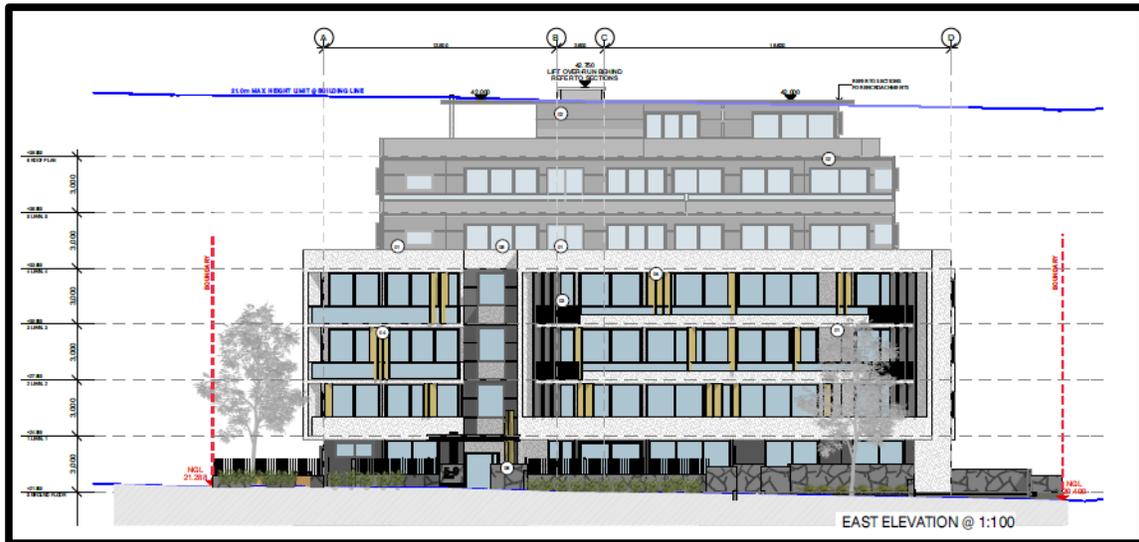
Front elevation of approved residential flat building at 5-9 John Street, Kogarah Bay (DA2017/0663) (Source: UrbanLink).
